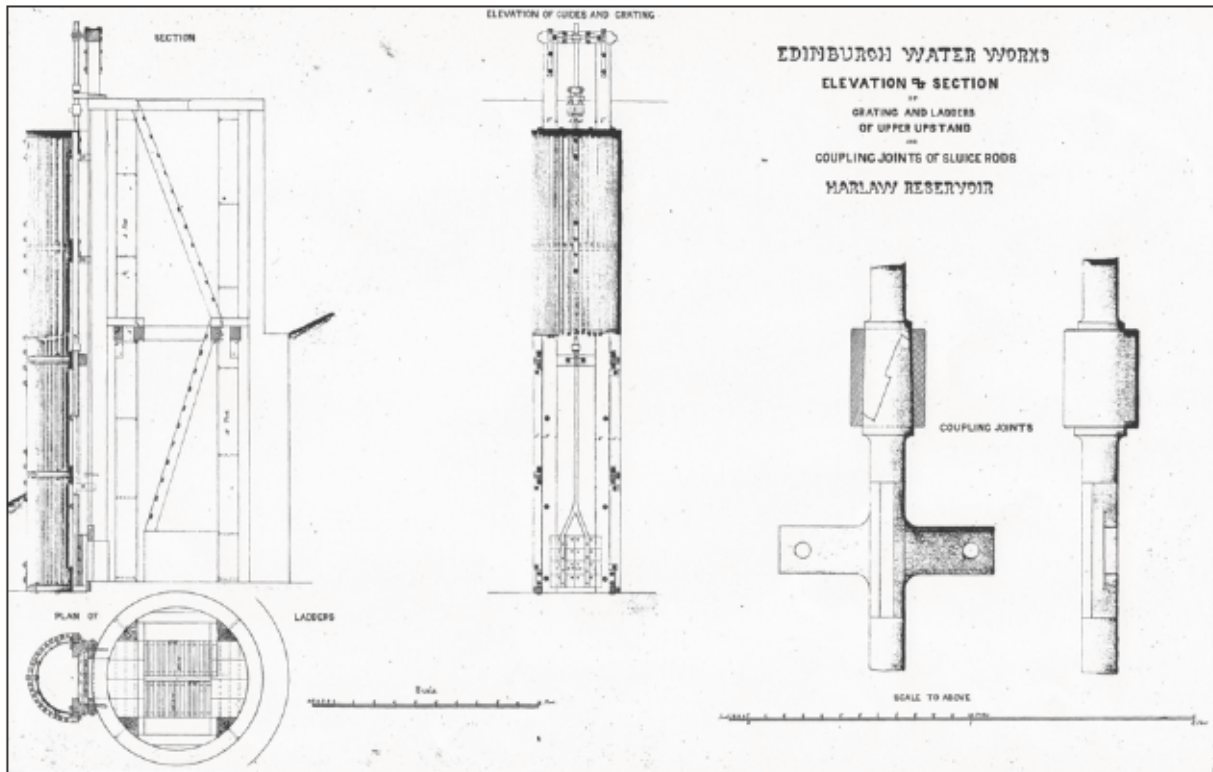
Elevation and Section Grating And Ladders Upper Upstand.
